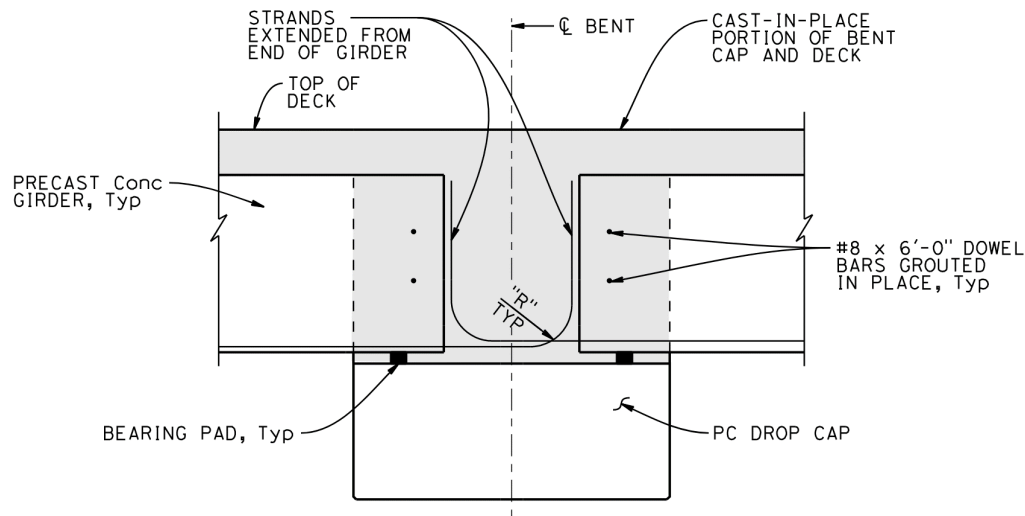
Precast Bent Cap with Integral Connection Detail
